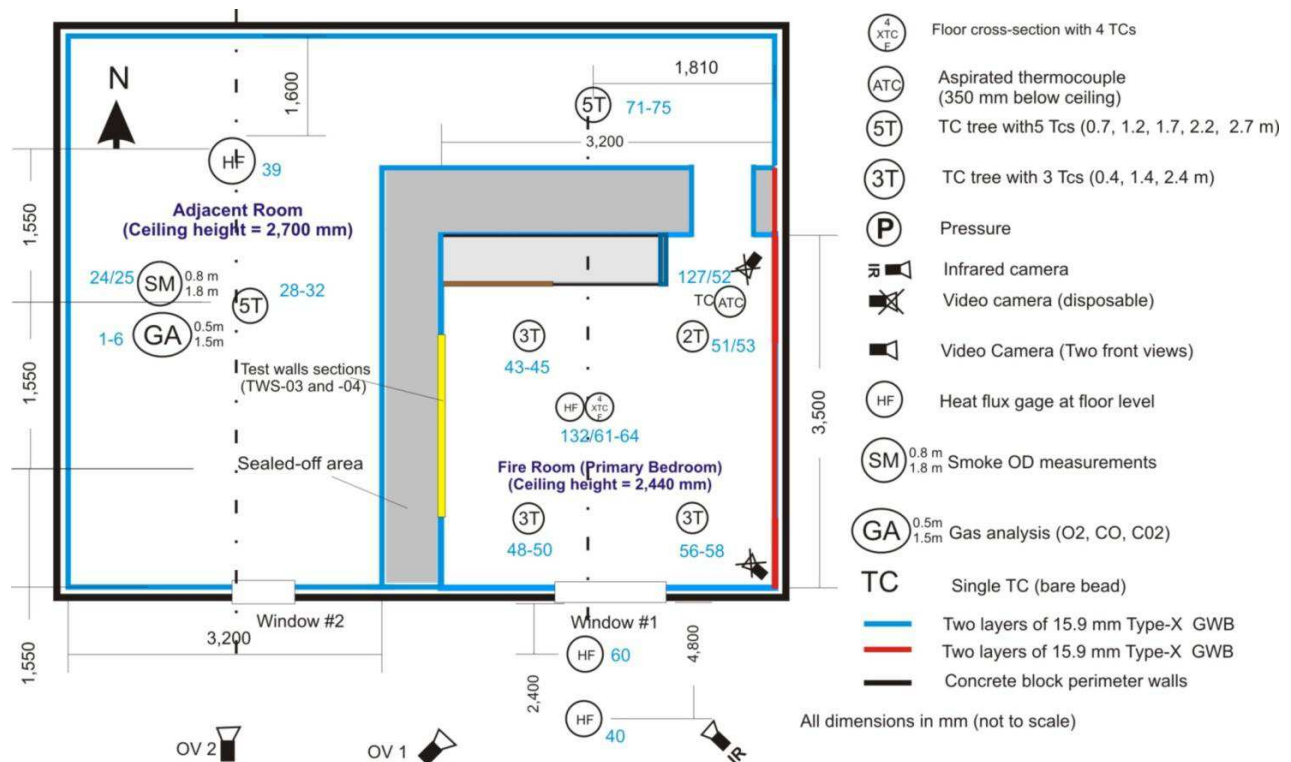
Test PRF-07 - Instrumentation floor plan showing location of TC trees.
